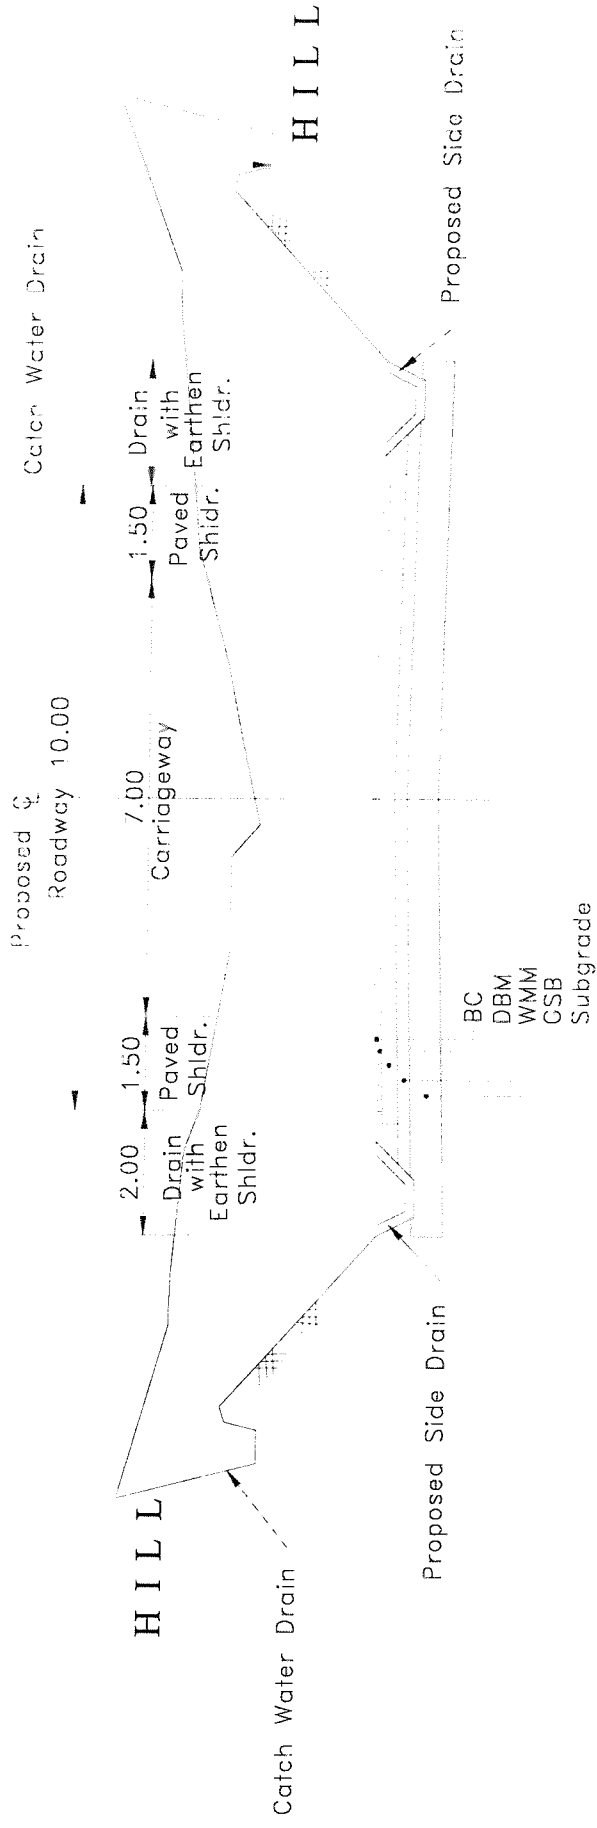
TYPICAL CROSS SECTION OF REALIGNMENT BY HILL CUTTING
